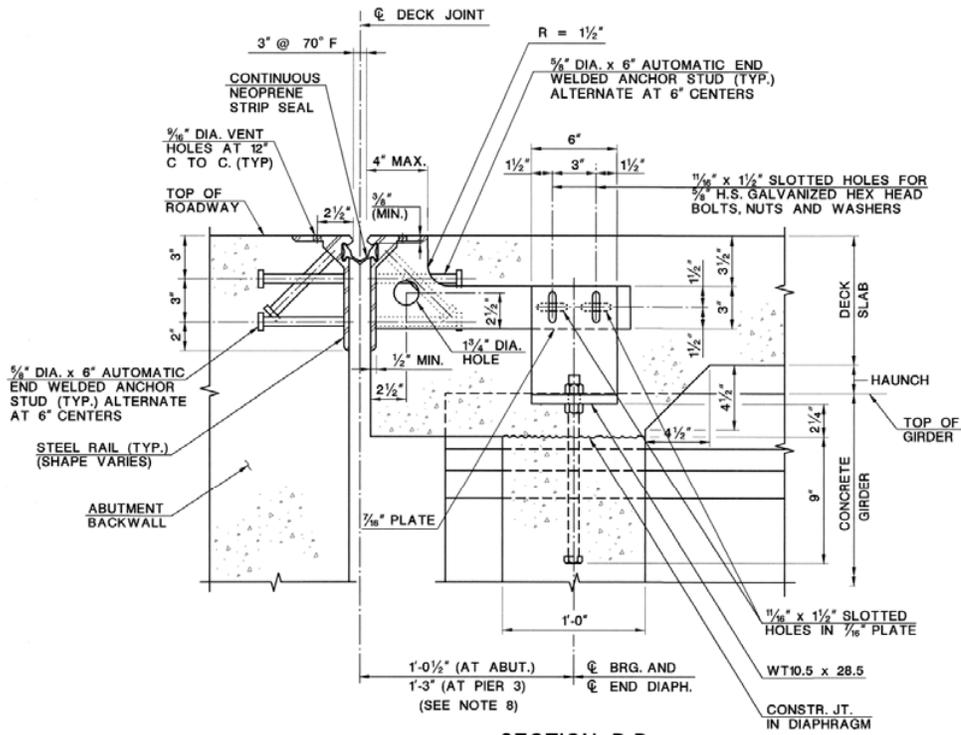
Expansion Joint Sections at End Diaphragm and Girder
